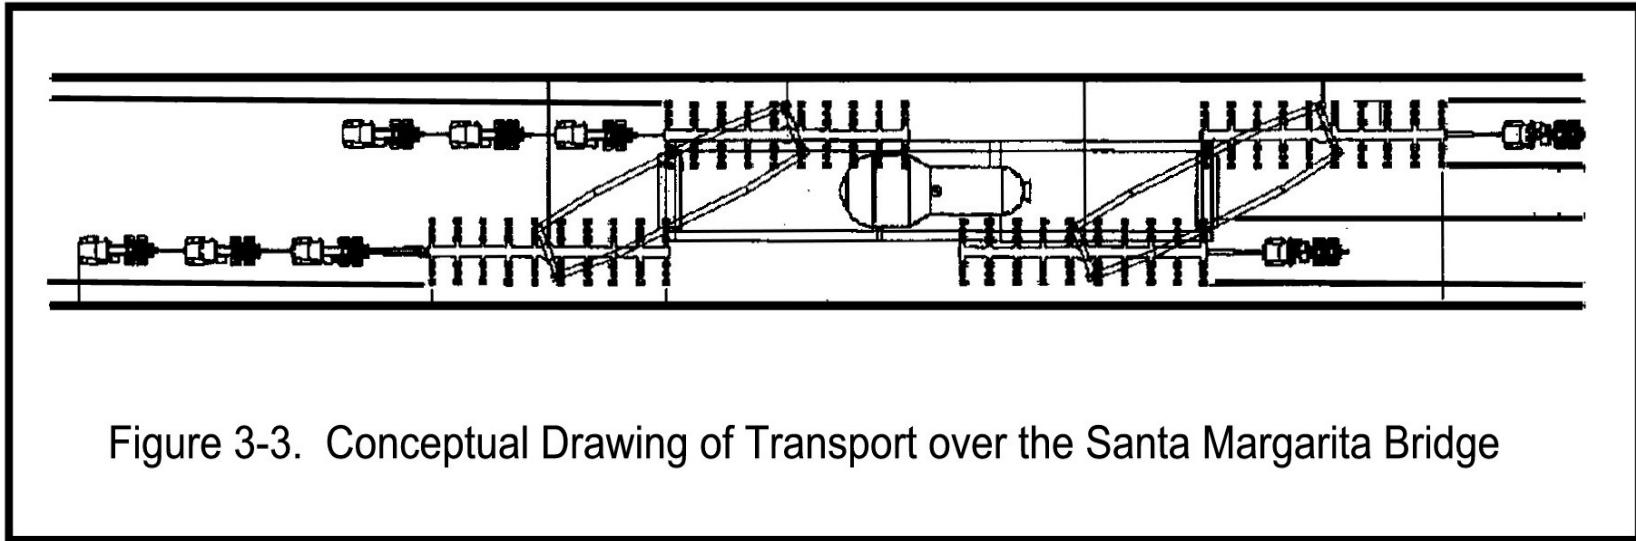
Conceptual Drawing of Transport over the Santa Margarita Bridge
